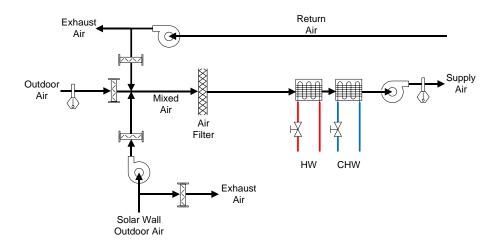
HVAC system diagram for the 3rd Precinct solar wall installation.
